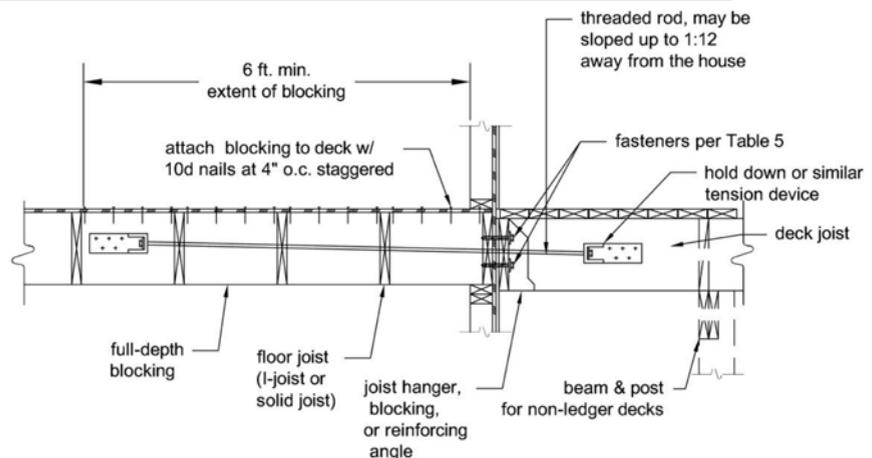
Lateral Load Device with Joists Perpendicular to Deck Joists.
